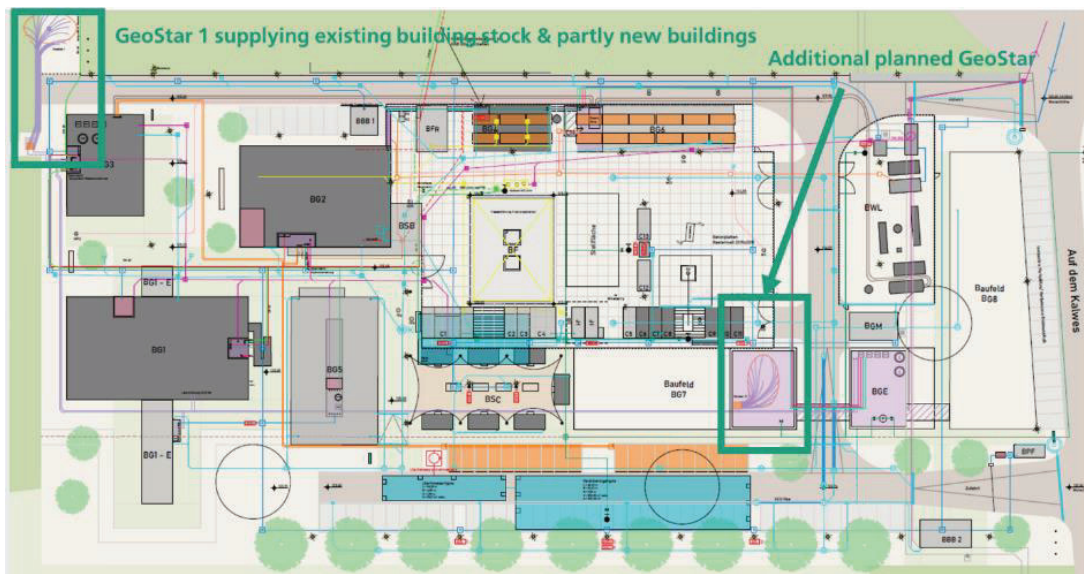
Site plan of existing (dark grey) and planned buildings (light grey); additional to GeoStar 1, another Geostar is planned to supply the new buildings
